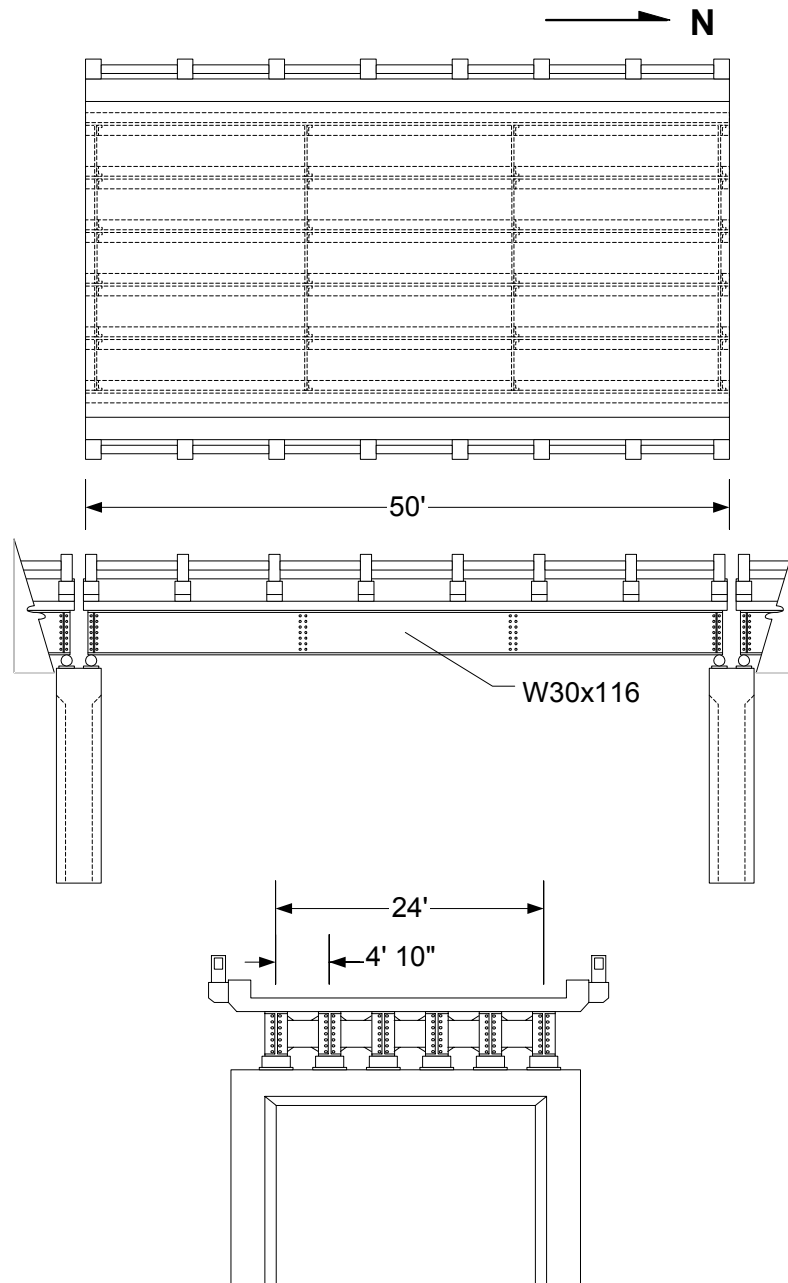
Structural details of the third span of the Alamosa Canyon Bridge
